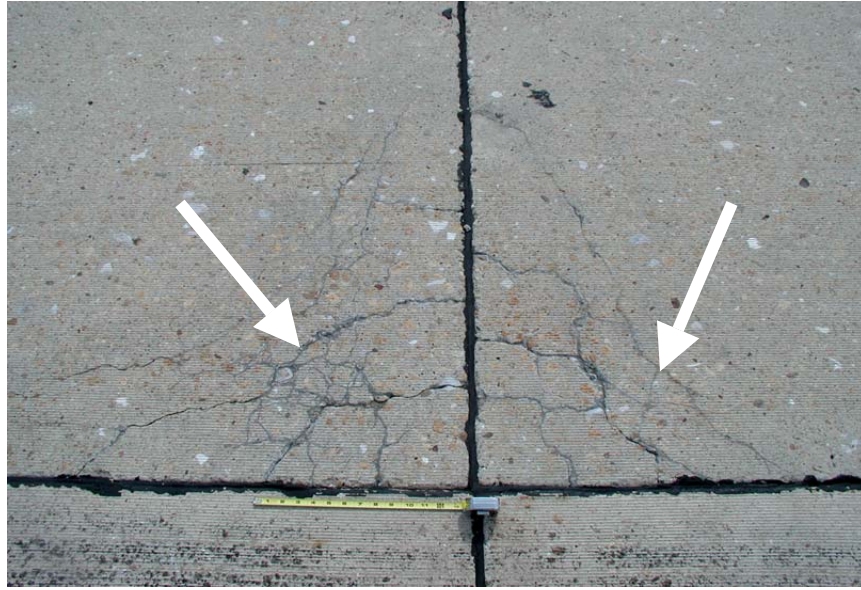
D-cracking (→) in an airfield pavement.
